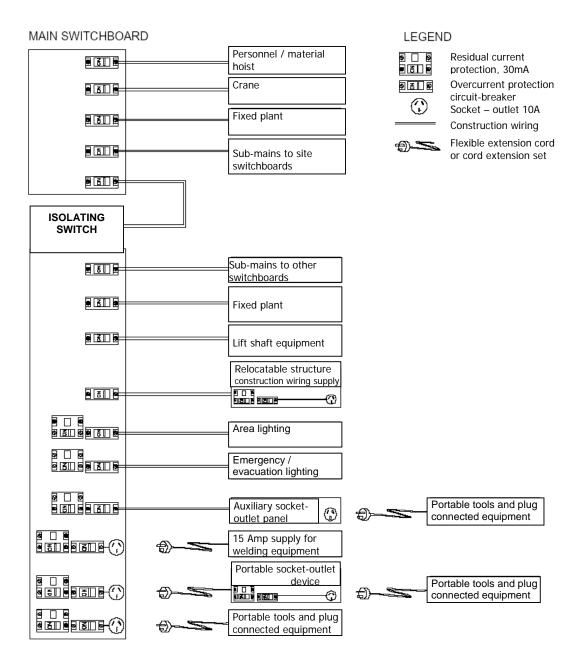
Guide to Arrangement of Switchboards, Construction Wiring and Equipment
